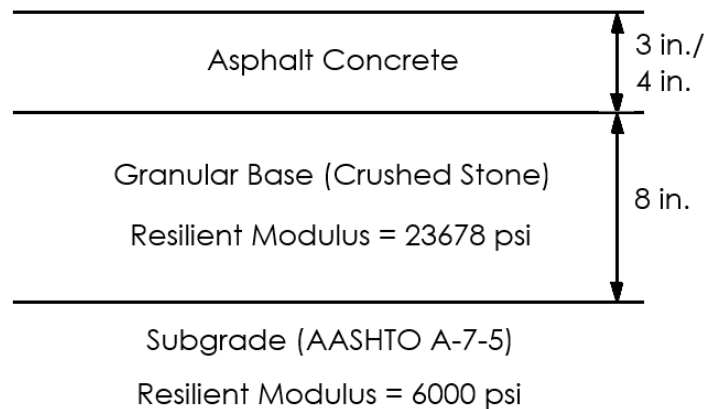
Model Pavement Section Used in M-E PDG Analysis
